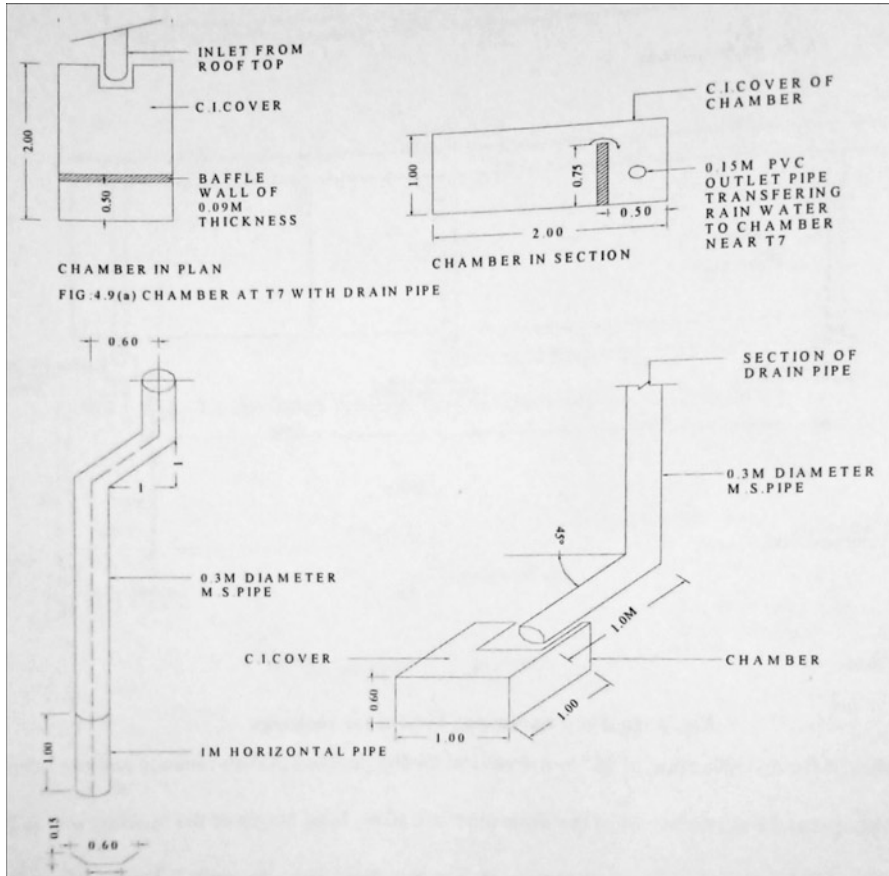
Details of chamber and gutter of roof top harvesting system
